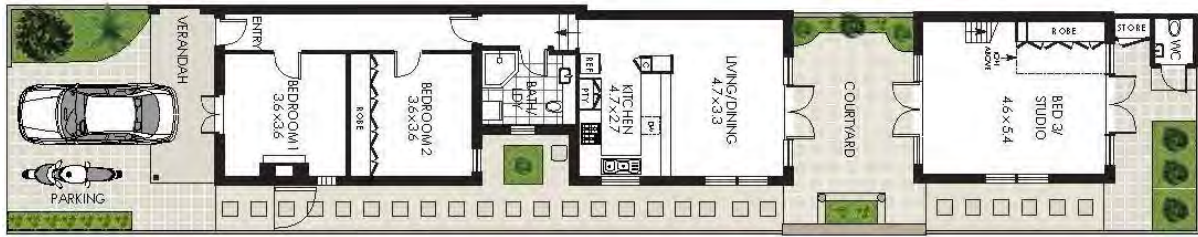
Floor plan of No.16 Byrnes Avenue. (Source: <https://www.realestate.com.au/sold/property-house-nsw-neutral+bay-136703118>)
